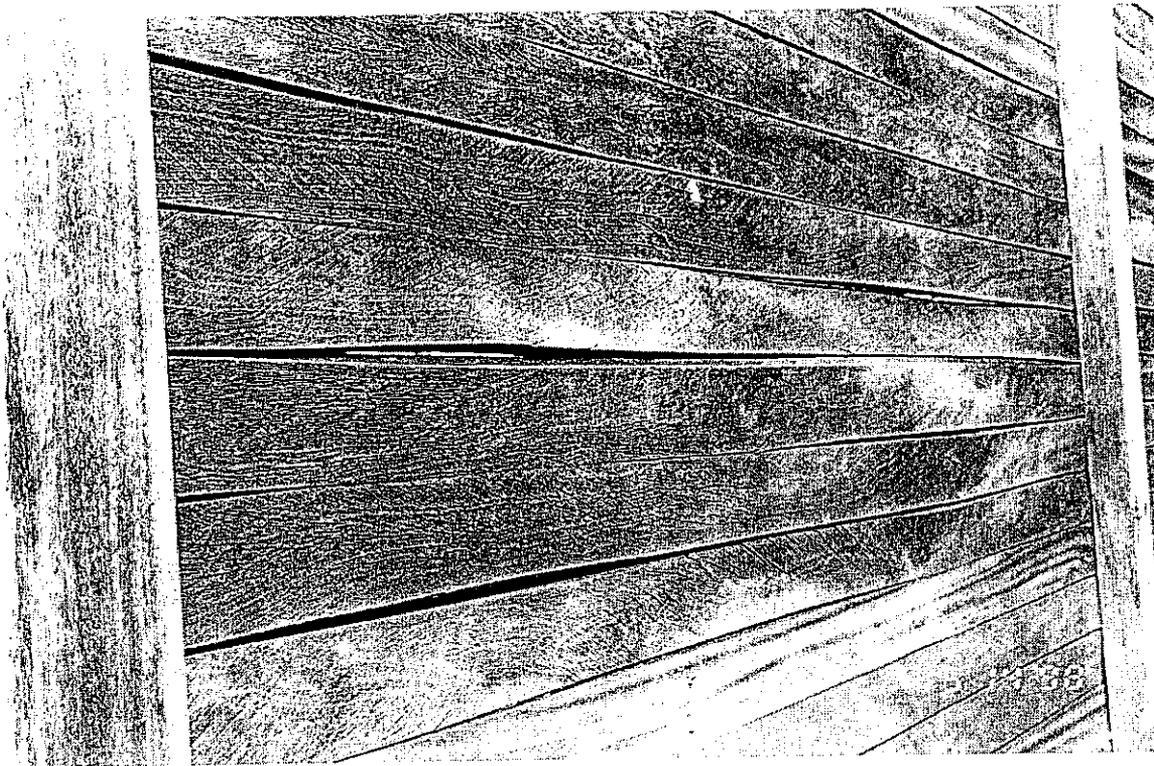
Tropical hardwood barrier, IL 53, warping of boards.
